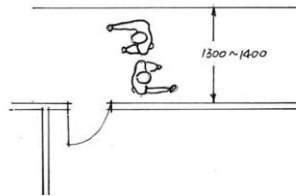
Doors on one side and wide enough for two people to pass one another unhindered. Width 1.30 to 1.40 m (Source: Authors)
